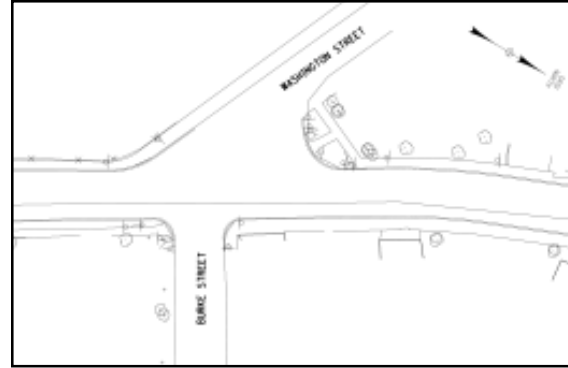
Existing intersection with Washington and Burke Streets.
